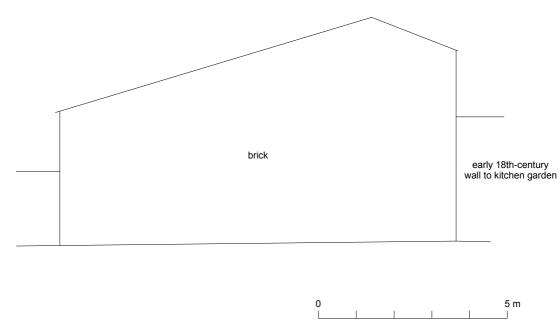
Structure 14, 1886-98 squash court south-east elevation.
